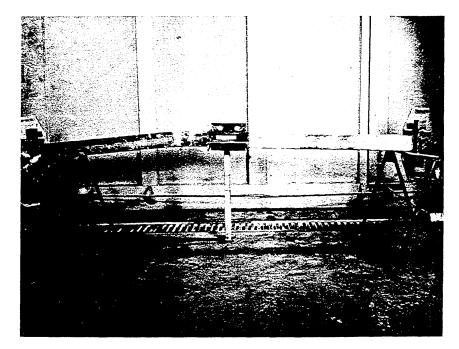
b. Plan View of Specimen 415 S 4 M 13.0
